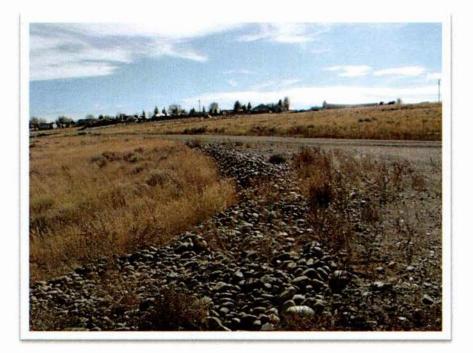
Road, fill material, and sediment control structure constructed at the 10 acre tract of land.
